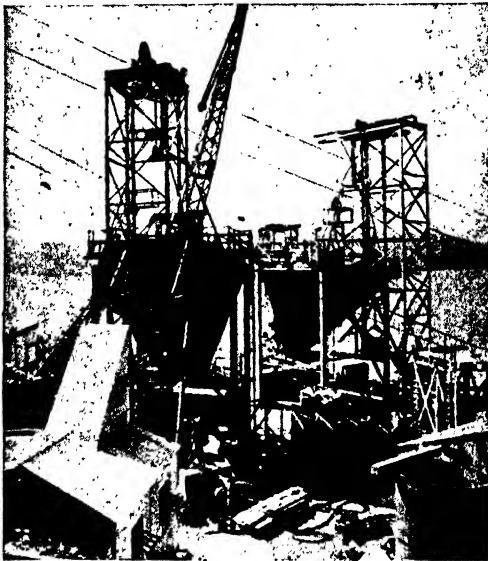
Headframes for shaft sinking at a double-shaft location, Delaware River Aqueduct. The steam derrick was used to start the shafts and was kept as a standby to remove the men from the holes in case of failure of the electric power on the hoists.
